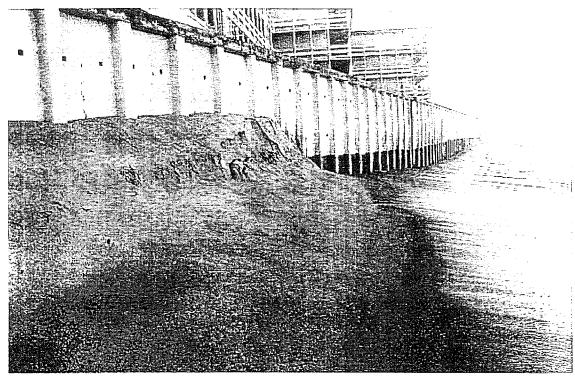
Concrete seawall protecting the Monterey Beach Hotel, which blocks lateral access along the beach at high tides.
